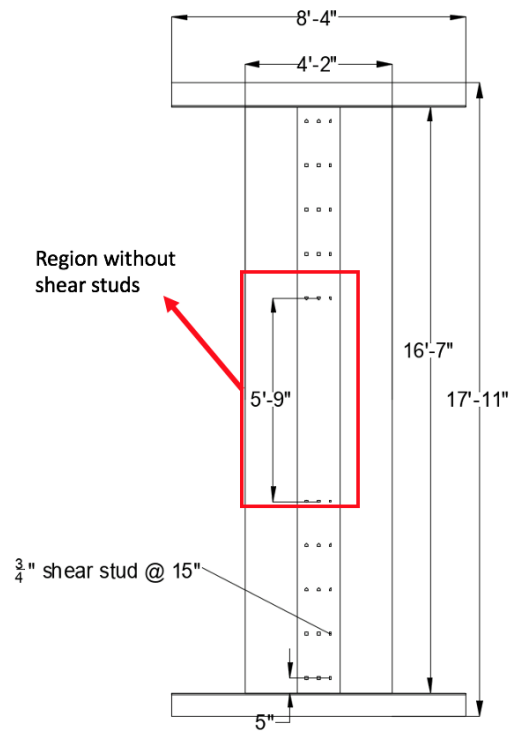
displays the girder elevation view of the actual bridge. The shear studs had different spacing at different regions of the bridge. In this study, a spacing of 15" between shear studs was selected as this type of shear stud distribution took up the longest region on the actual bridge. As the steel girder used on the actual bridge deck was a plate girder with a 14"-wide flange and 4-feet-tall web, it was considered unnecessary to make the steel girder as deep for this laboratory model. Therefore, a W14x90 model was selected to keep the flange width but with a shorter web depth.
